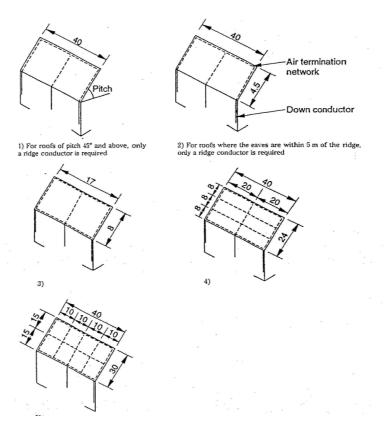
Air terminations and concealed conductors for buildings less than 20m high with high sloping roofs
